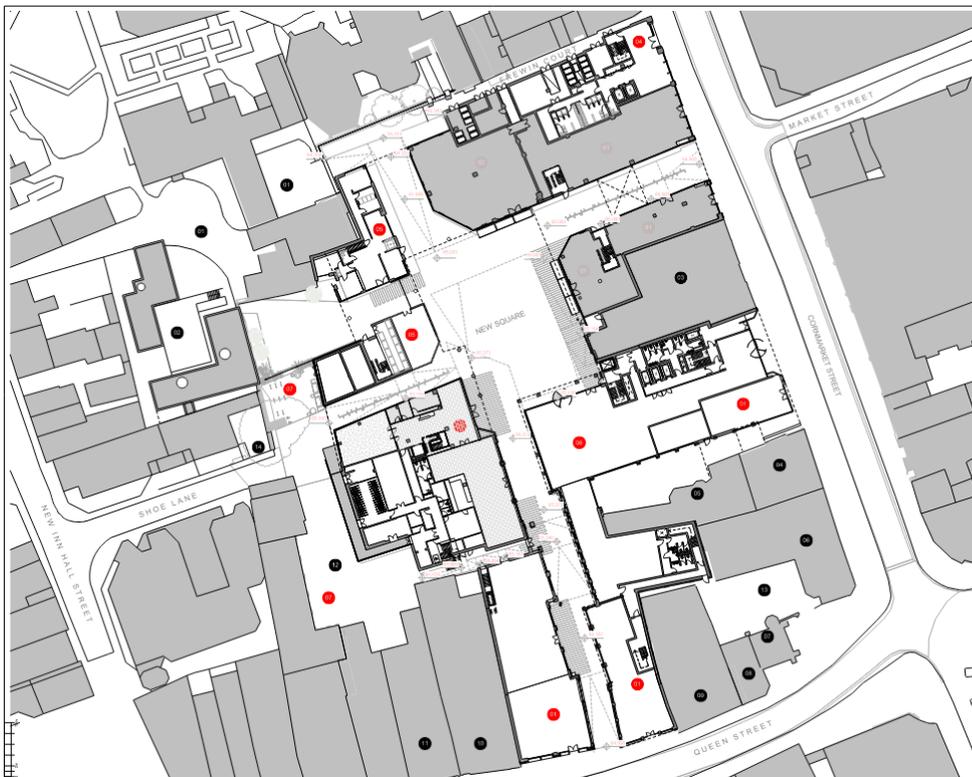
Extract from Development Plans Appendix C - Ground Floor Masterplan as Proposed, Revision K
